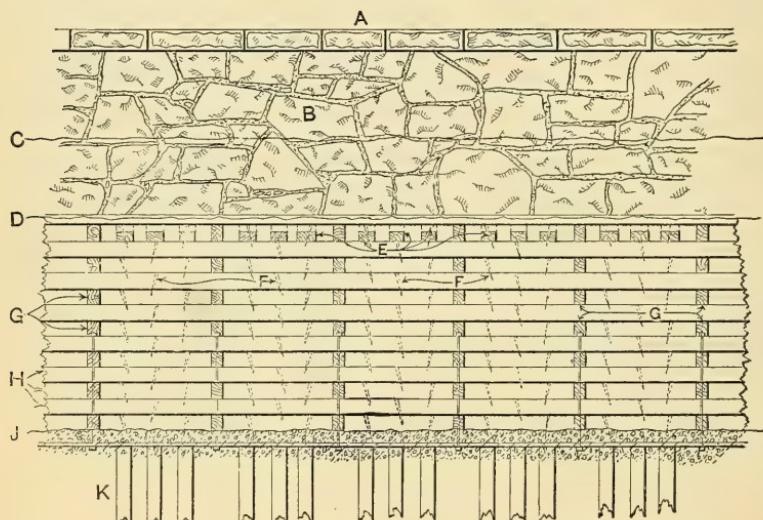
ELEVATION OF CRIB AT PROVIDENCE, R. I.
